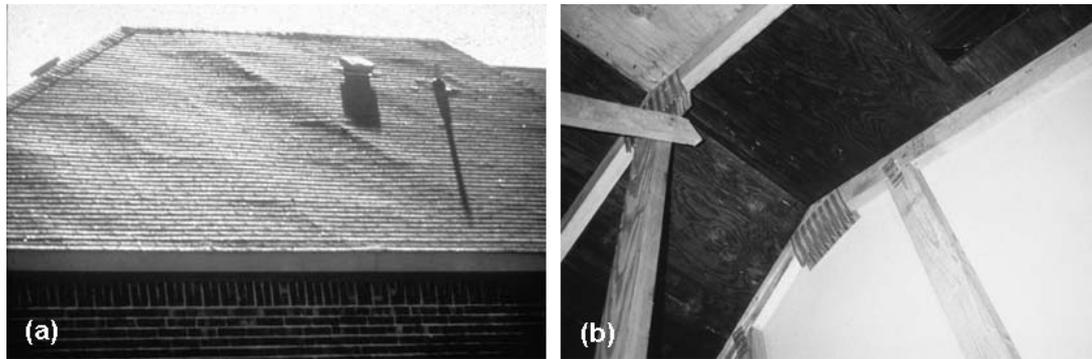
a) outside view of failed FR-treated plywood roof sheathing; and b) top left—inside view of fully serviceable untreated plywood roof sheathing; center—thermally degraded FR-treated plywood roof sheathing; and lower right—gypsum-sheathed 60-minute-rated fire wall.
